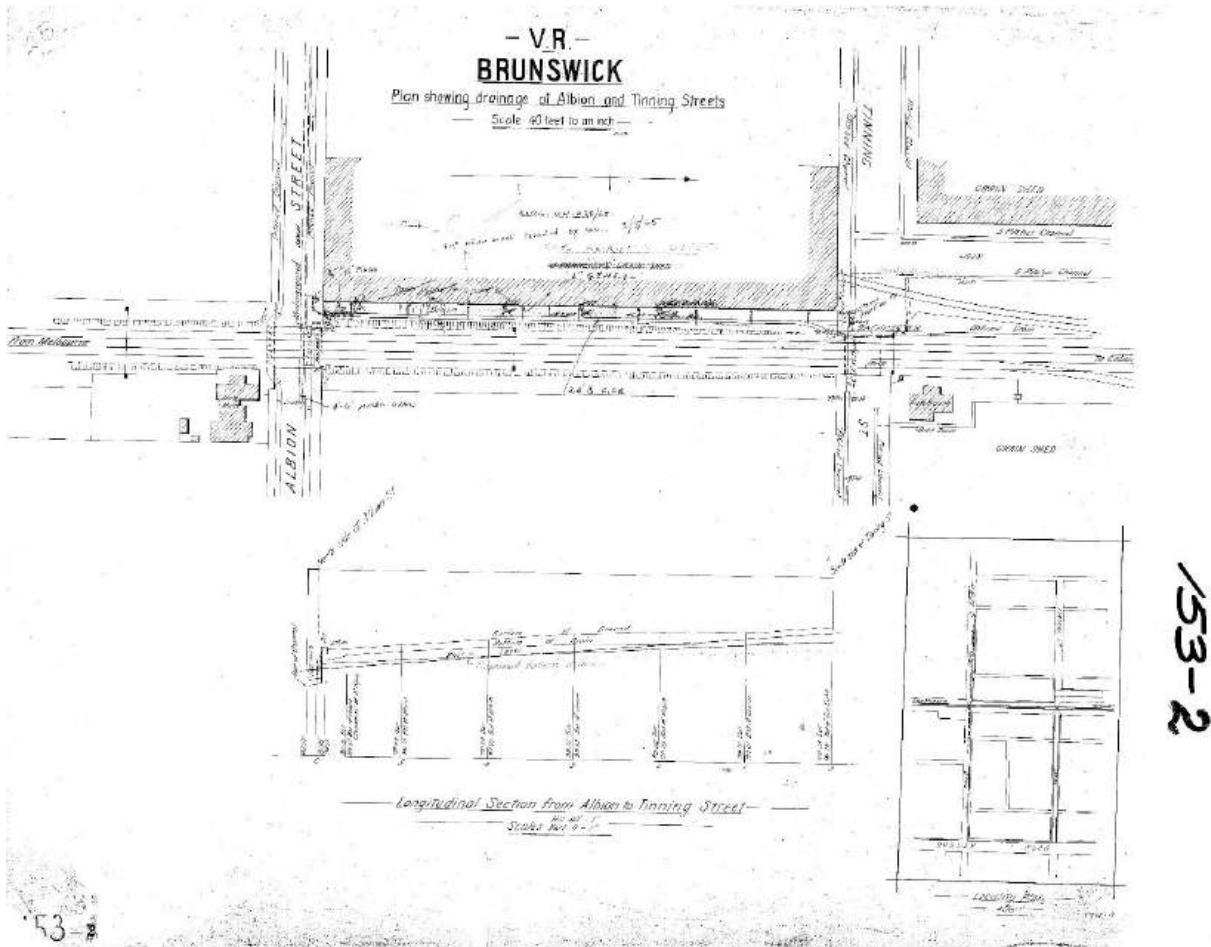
a 1965 Detail drawing of the Albion Street intersection and Tinning Street intersection. Plan shows gatekeepers cabin at south-west of Albion Street intersection and gatehouse at north-east of Tinning Street intersection. North is to right. (Public transport Victoria Drawing Management System. 10/06/2020).
